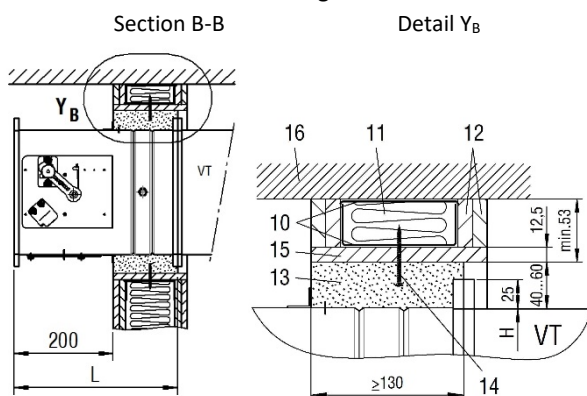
Wet installation in lightweight partition wall under solid ceiling
